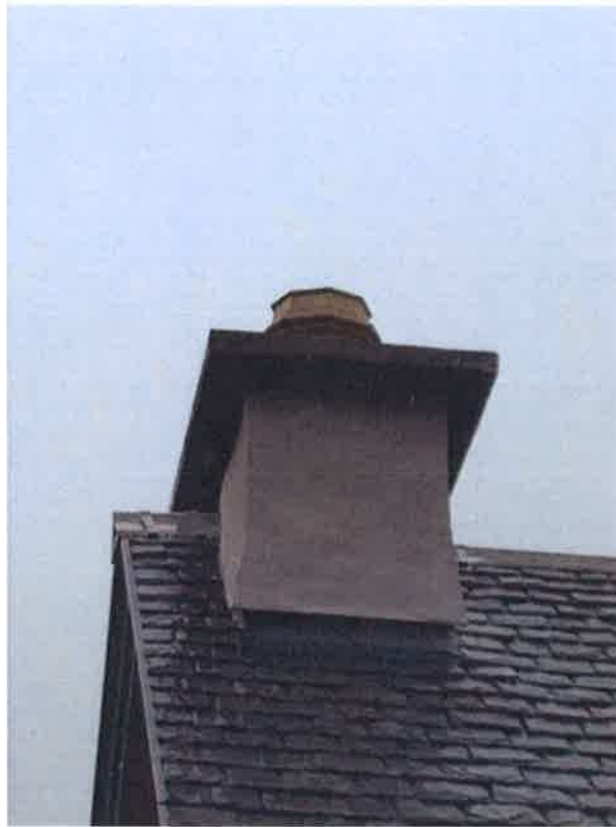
(above): Roof and windows – rear elevation – 13 May 2011
